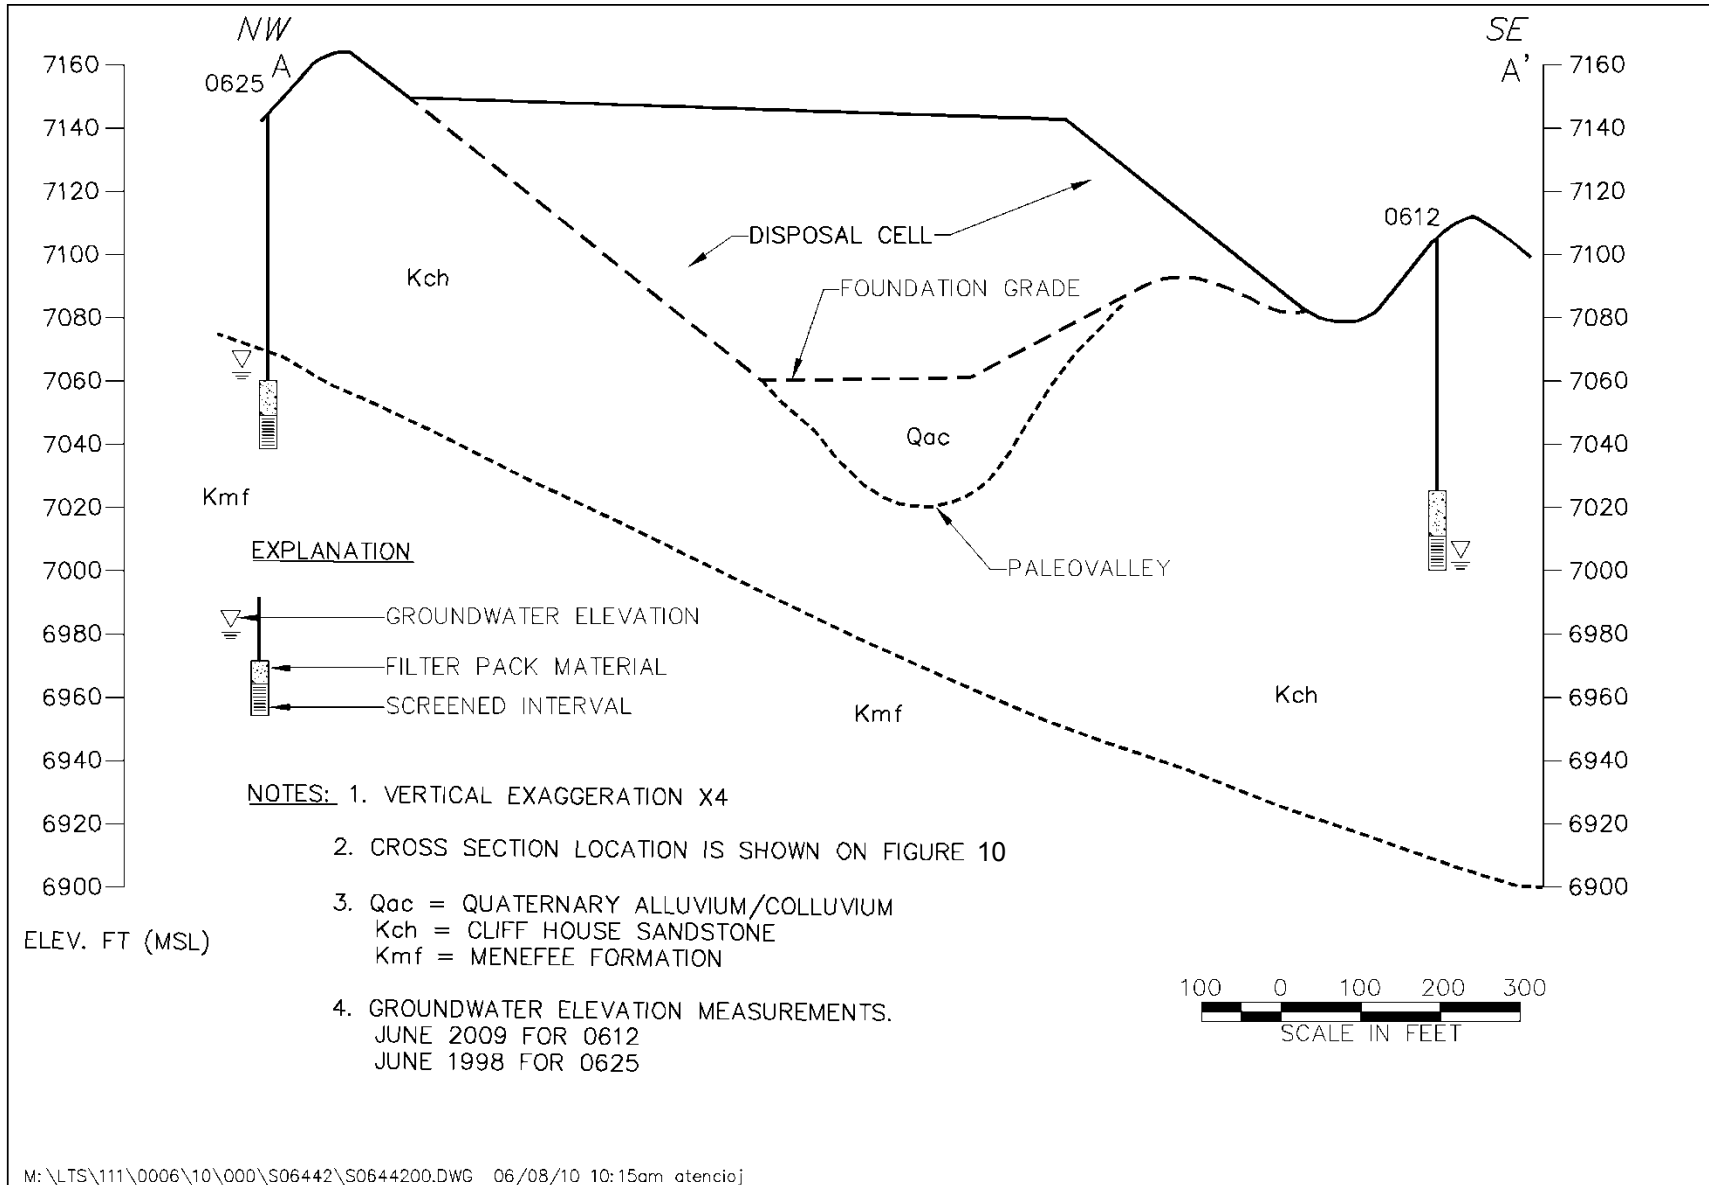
Cross Section A-A' at the Durango, Colorado, Disposal Site
